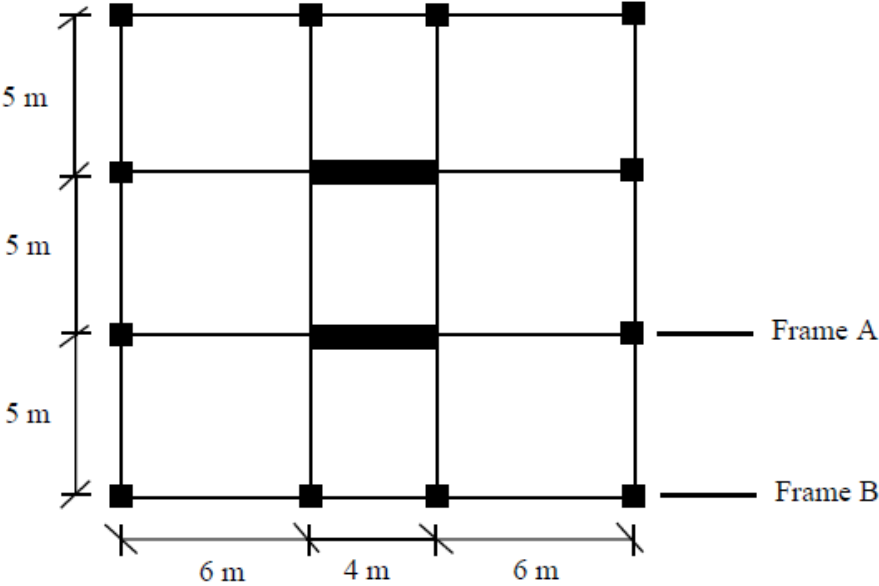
Story plan of the twenty story wall-frame building with full capacity design
